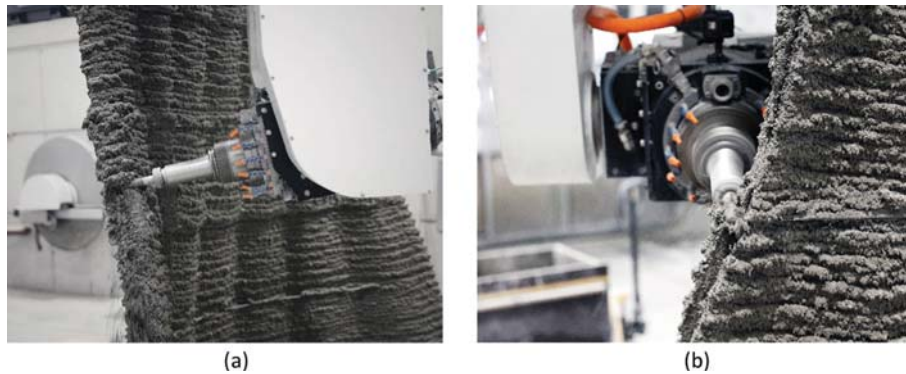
Surface finishing: (a) Vertical finishing using a 20 cm steel disc with blades; (b) horizontal finishing using a 20 cm diameter flat steel disc.
